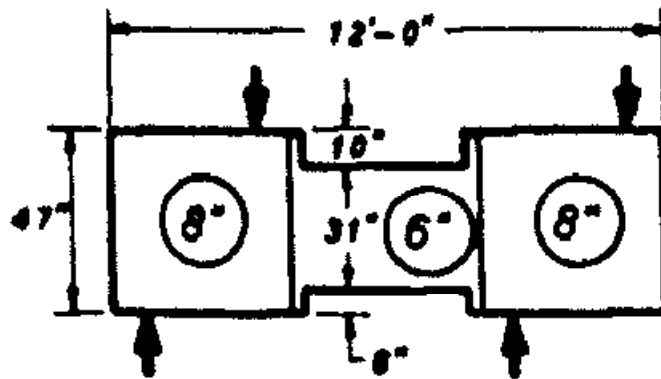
Loading Pattern and Principal Dimensions of Test Specimen (Paulay, 1971)
